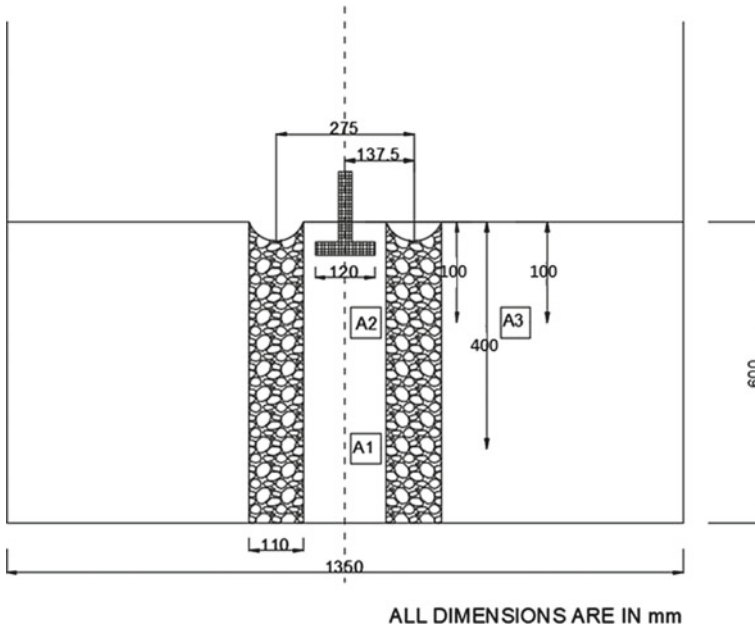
Model ground reinforced with four stone columns—Sectional view
